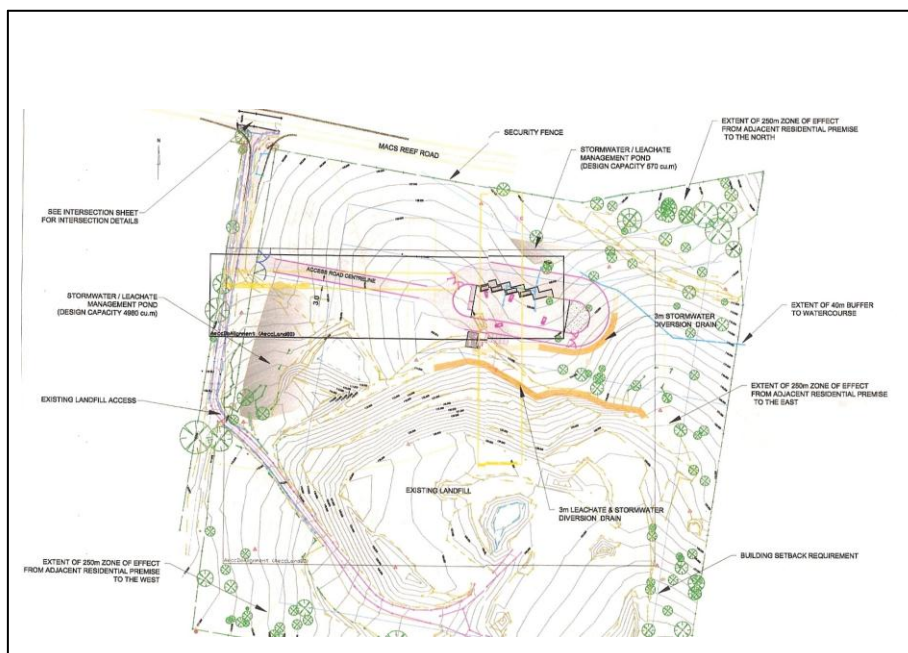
Survey plan of existing tip area and planned waste transfer station.
